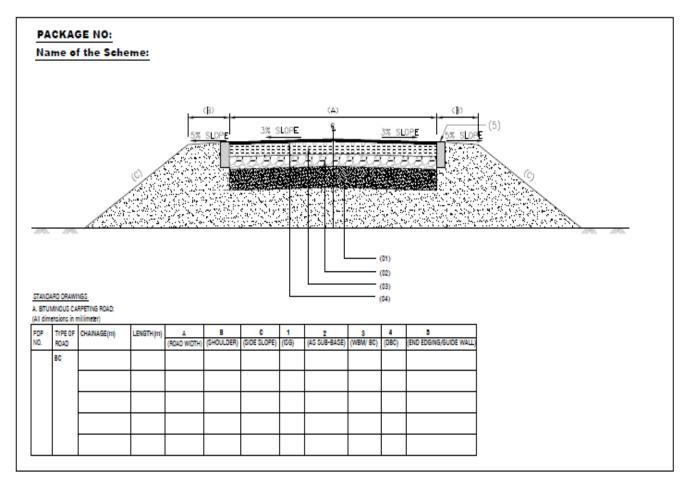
Typical Road Sections Bituminous Surfacing (Brick Road)
